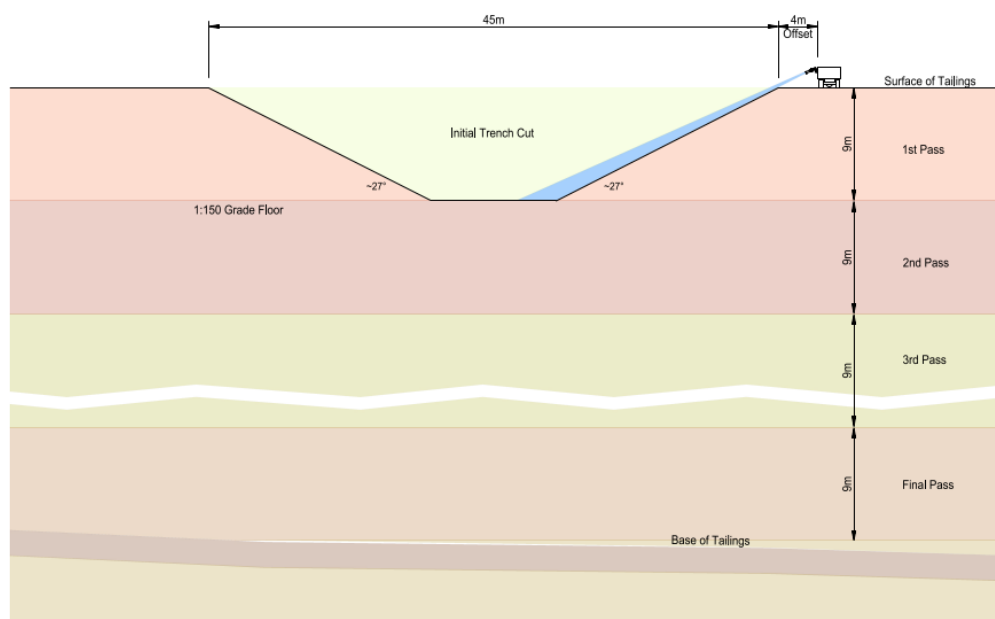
Hydraulic Mining Launder Typical Cross Section example at 9m flitches
